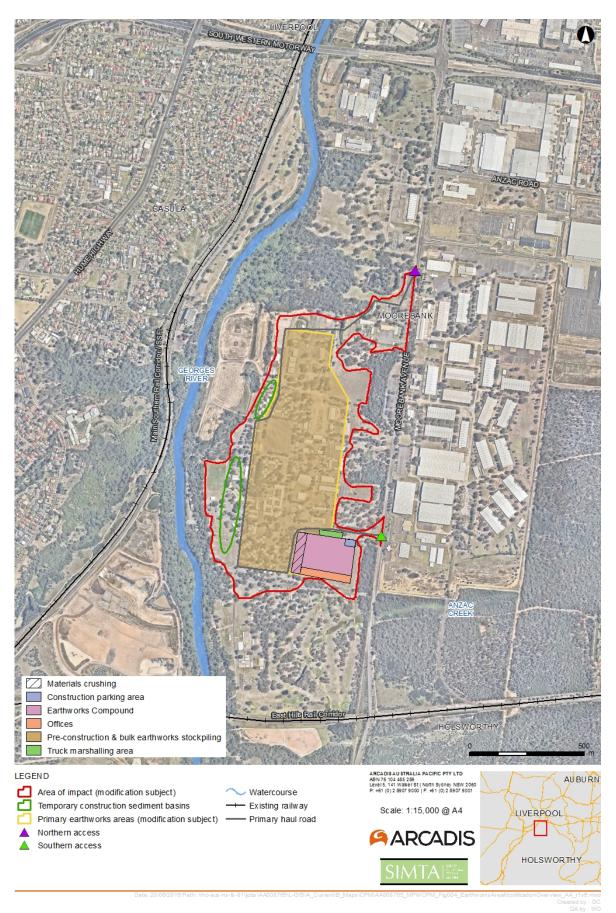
Proposed earthworks (MPW Concept Plan Modification)
